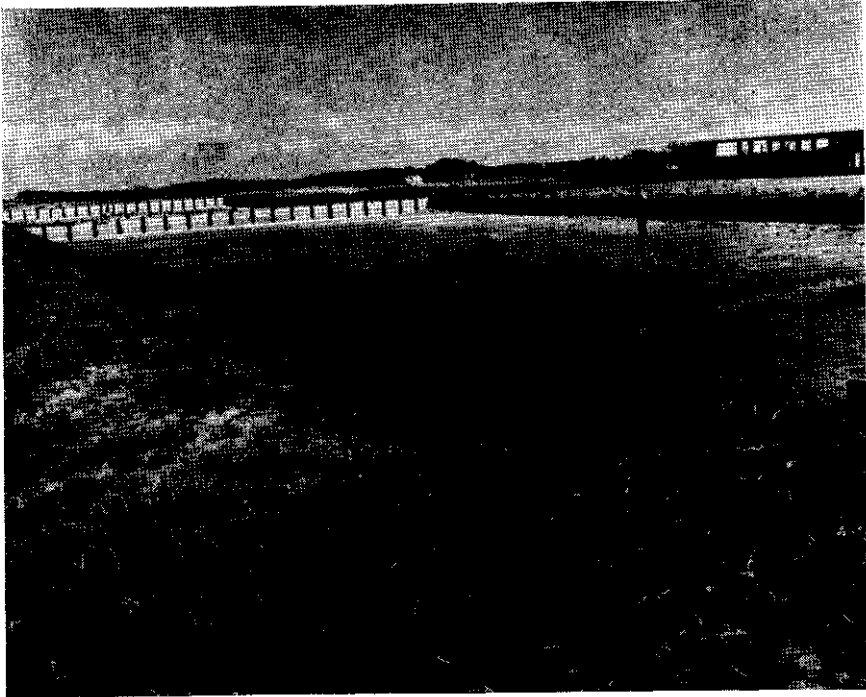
One of the 0.25-acre (D) ponds constructed in 1968. The sand fill bottom slopes gradually toward the ditch to insure complete draining.
